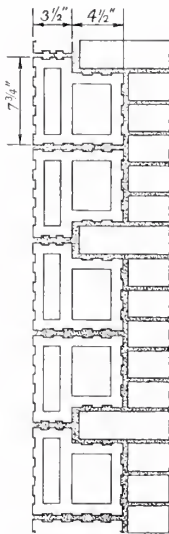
Cross section of twelve-inch PERFECTION backed brick veneer wall showing method of bonding and dimensions.
